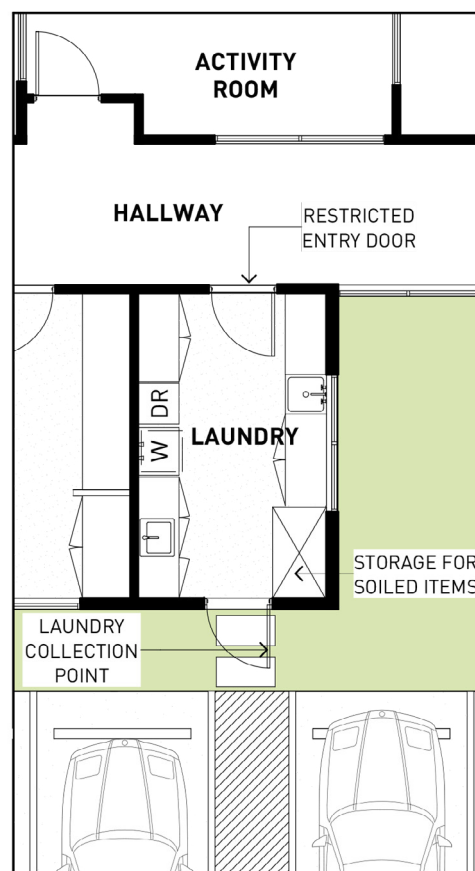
A typical child care facility laundry layout. External access may be provided if laundry is done off site or for deliveries.
